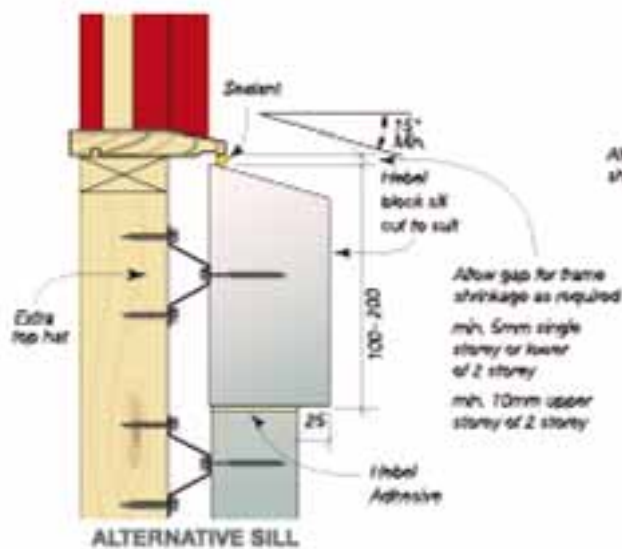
Typical Window Sill Detail & Timber Window Frame
